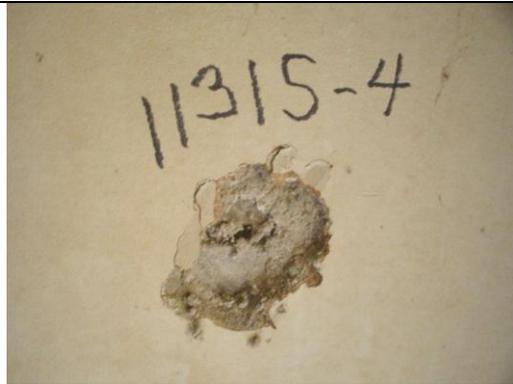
Plaster (1131S-4) Bedroom 3, Wall D. No Asbestos Detected.
